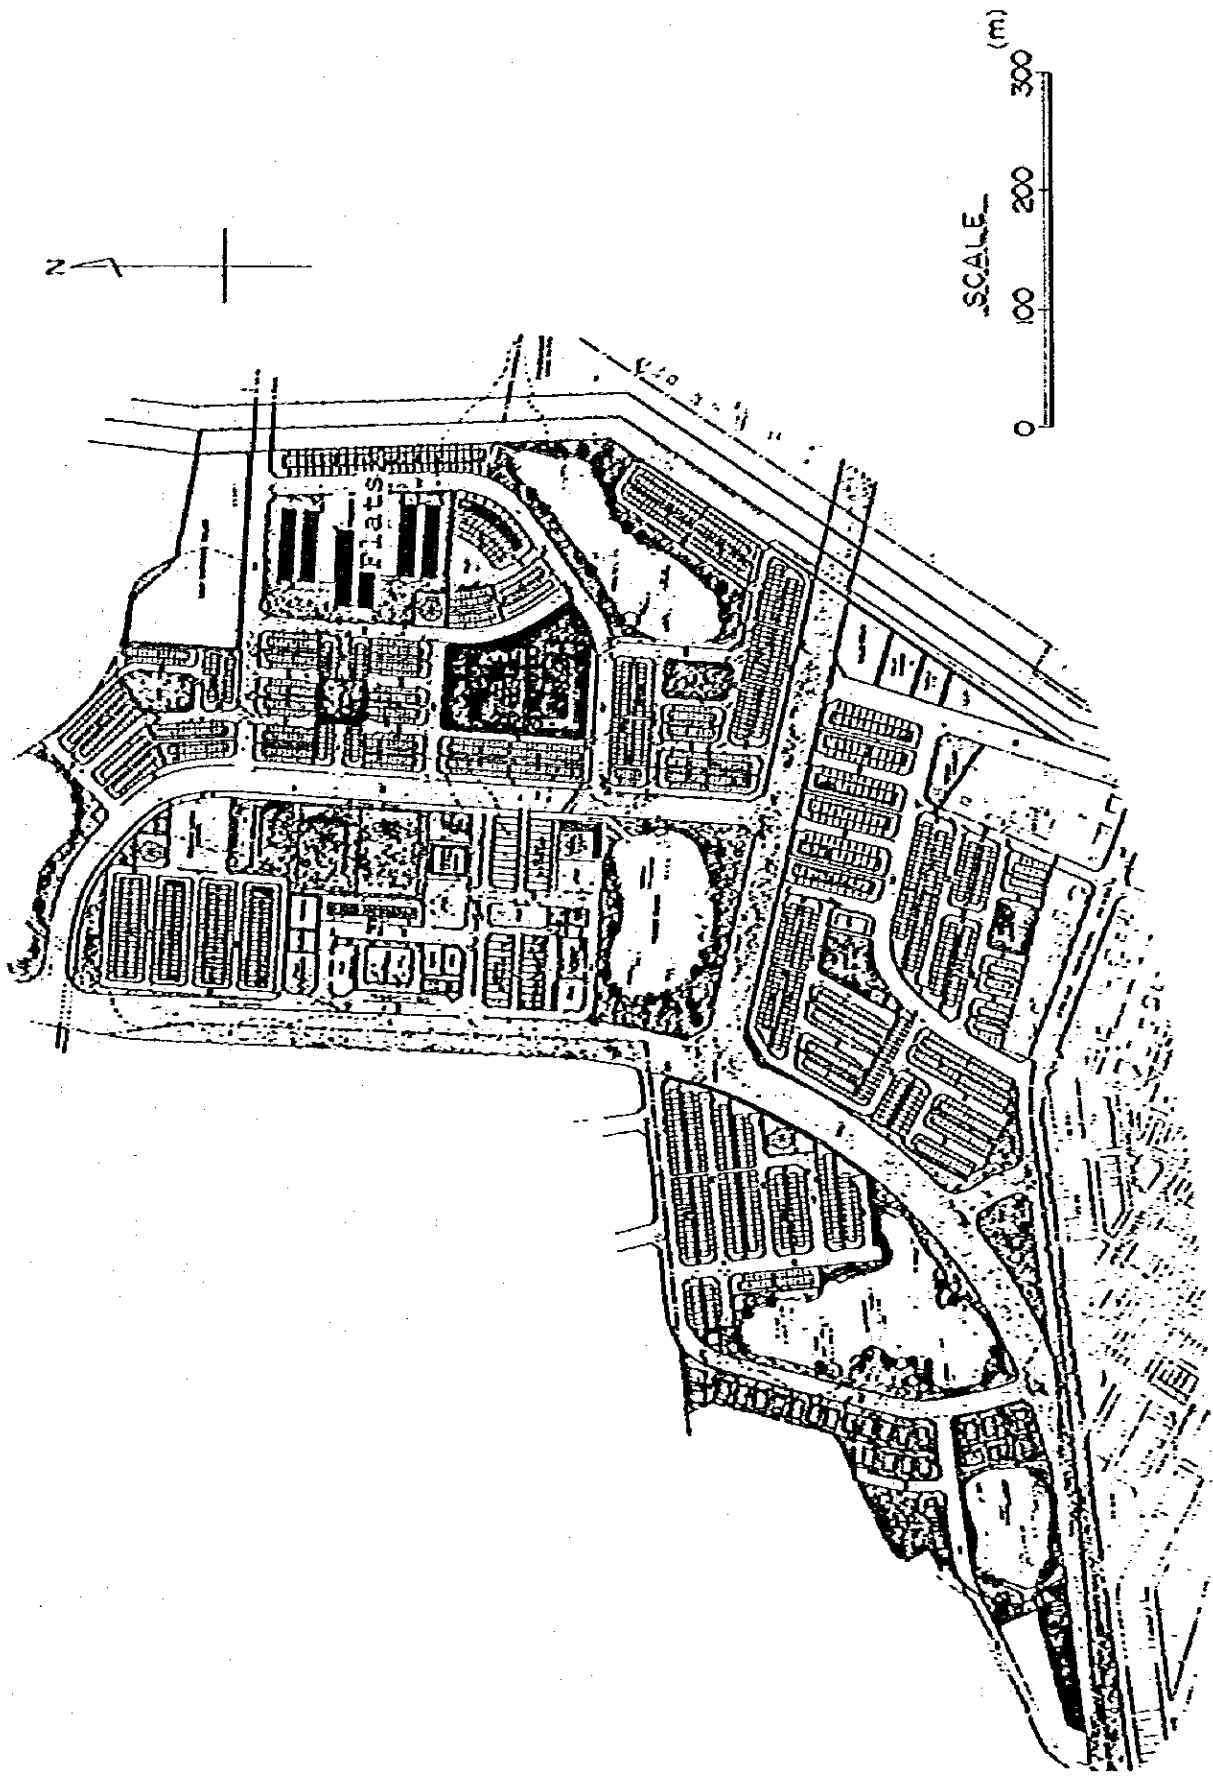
Layout Plan for Housing Development at Kampong Pandan
